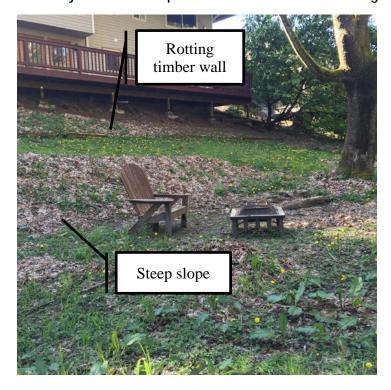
Backyard Prior to Replacement of Stairs and Retaining Wall
